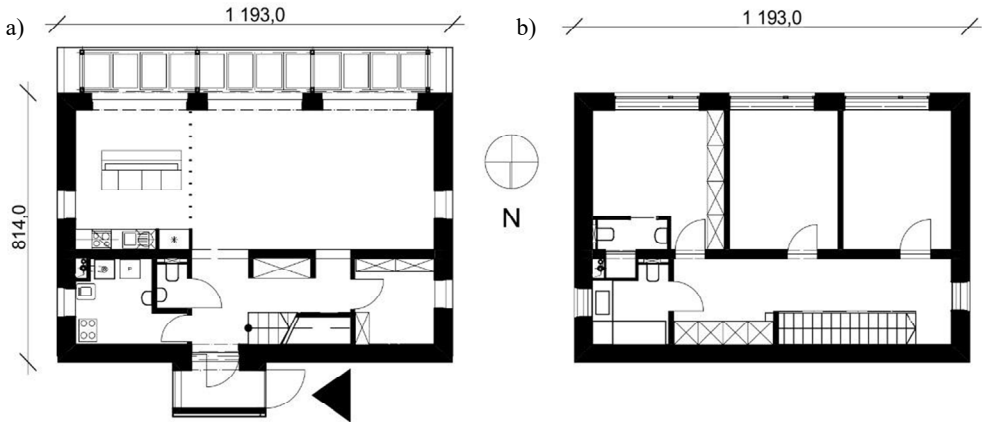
Floor plan of the building, a) ground floor, b) first floor. Source: Own elaboration.
